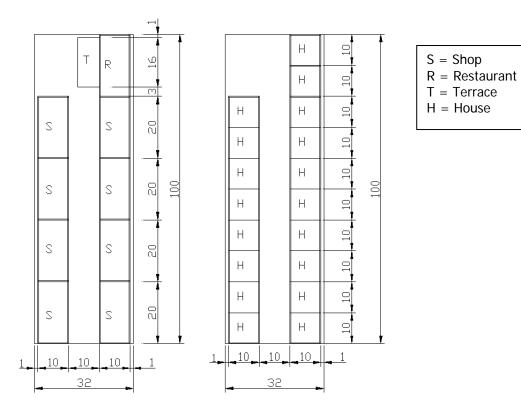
Left: plan for ground flour. Right: plan for top flour.
